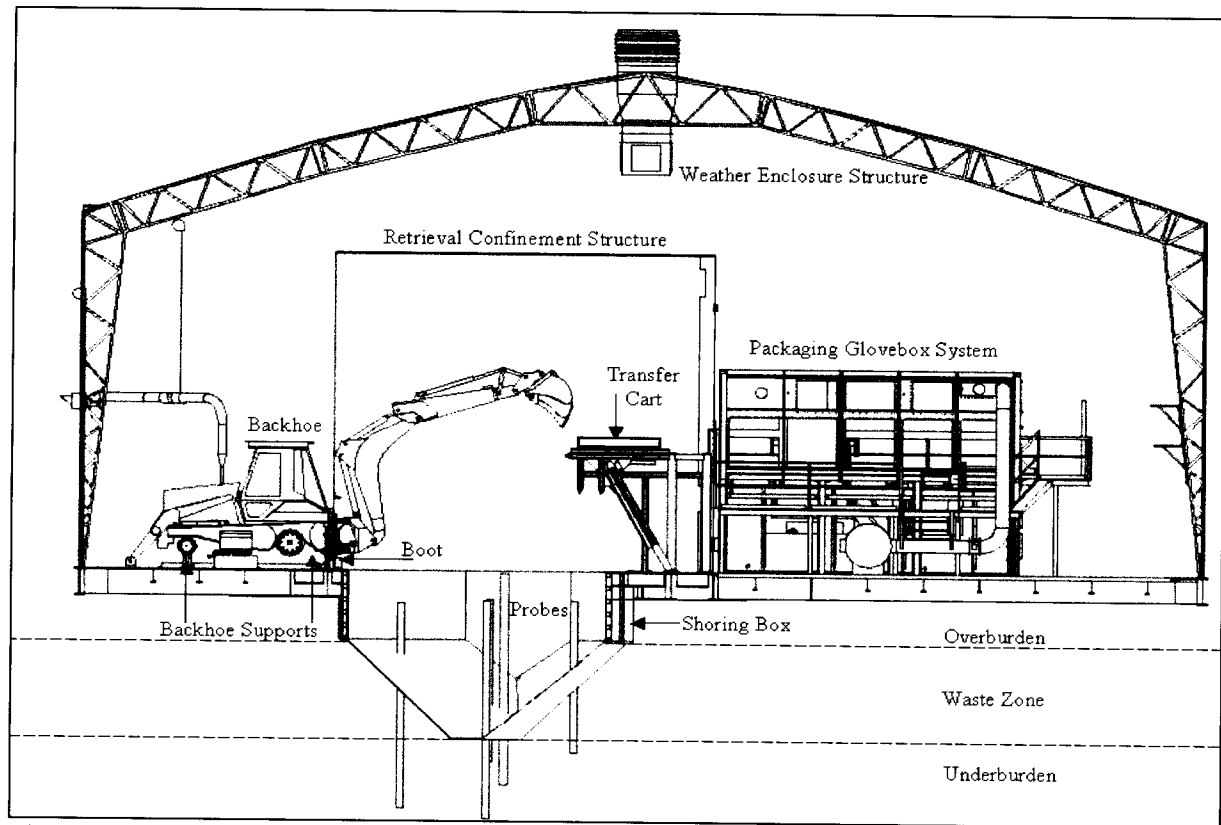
Cross section of the Glovebox Excavator Method Project facility.
